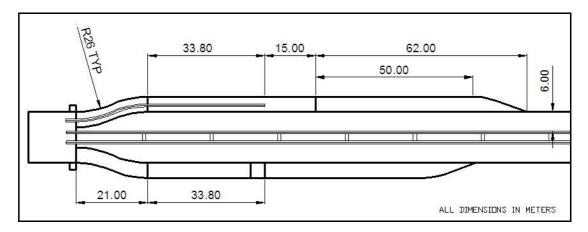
Top View On/off Switch Dimensions #2
